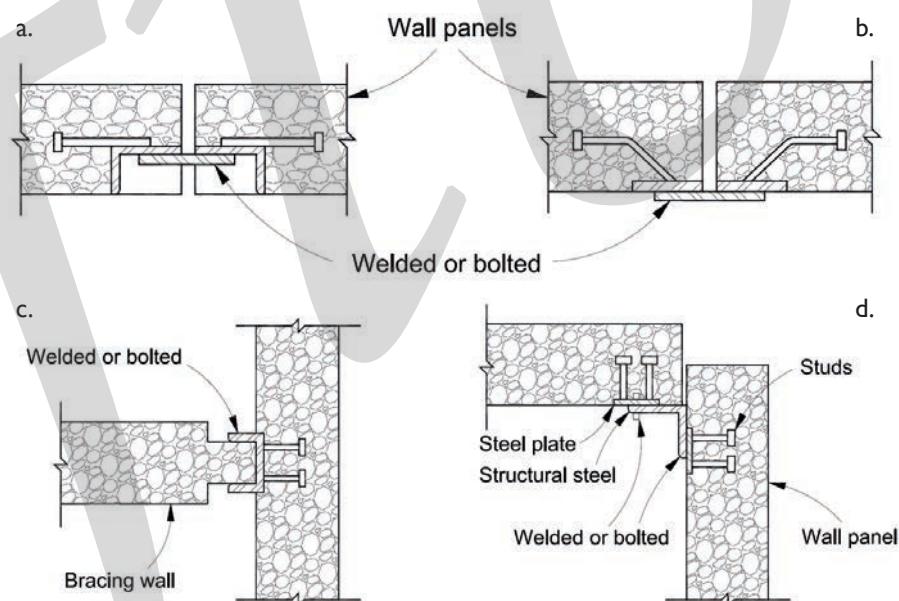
A range of dry vertical joints for prefabricated wall panels
